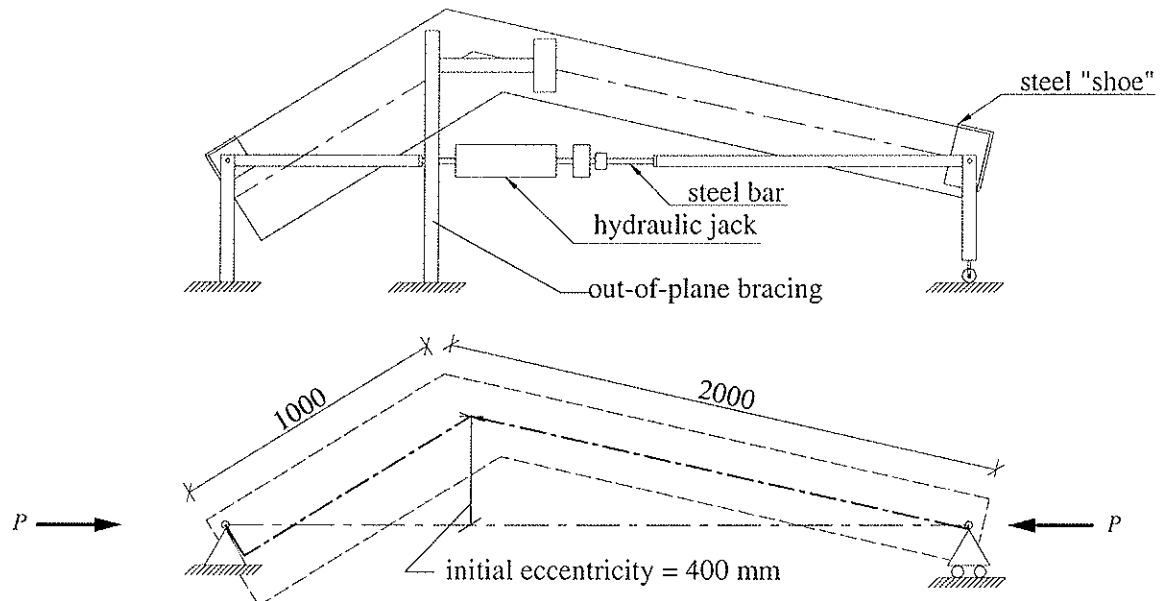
Test set-up of a truss segment. Dimensions in mm.
